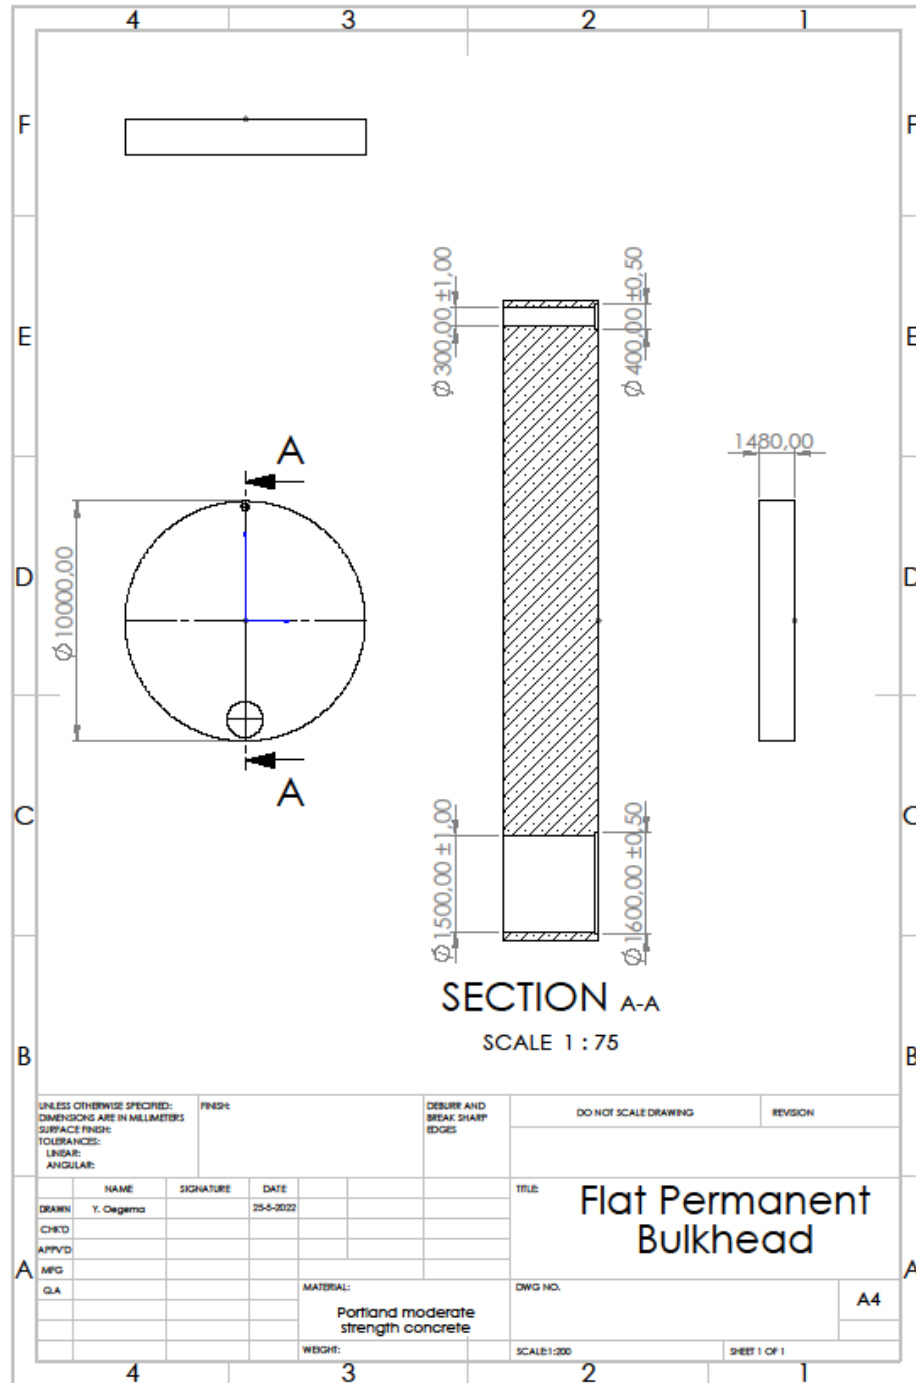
2D technical drawing for the flat permanent bulkhead, dimensions are in millimeters
